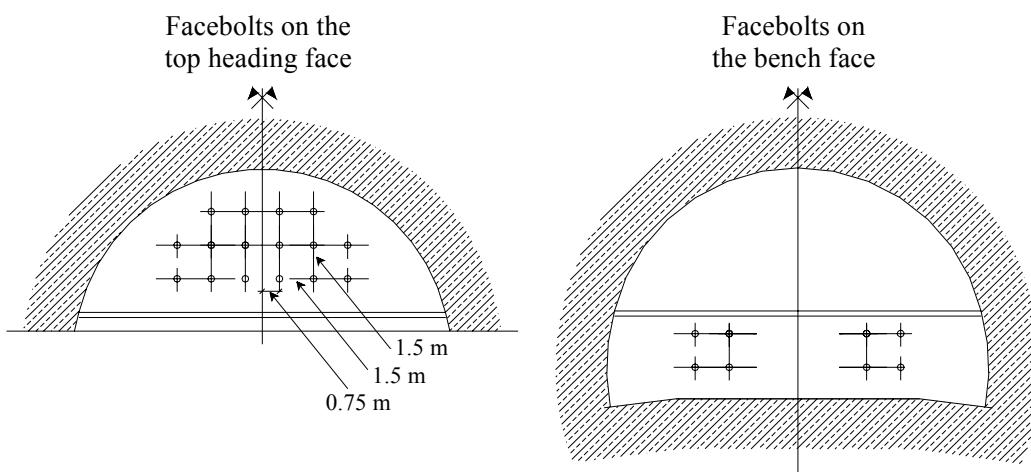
Typical Face Bolt Pattern (Astaldi, 2004)
